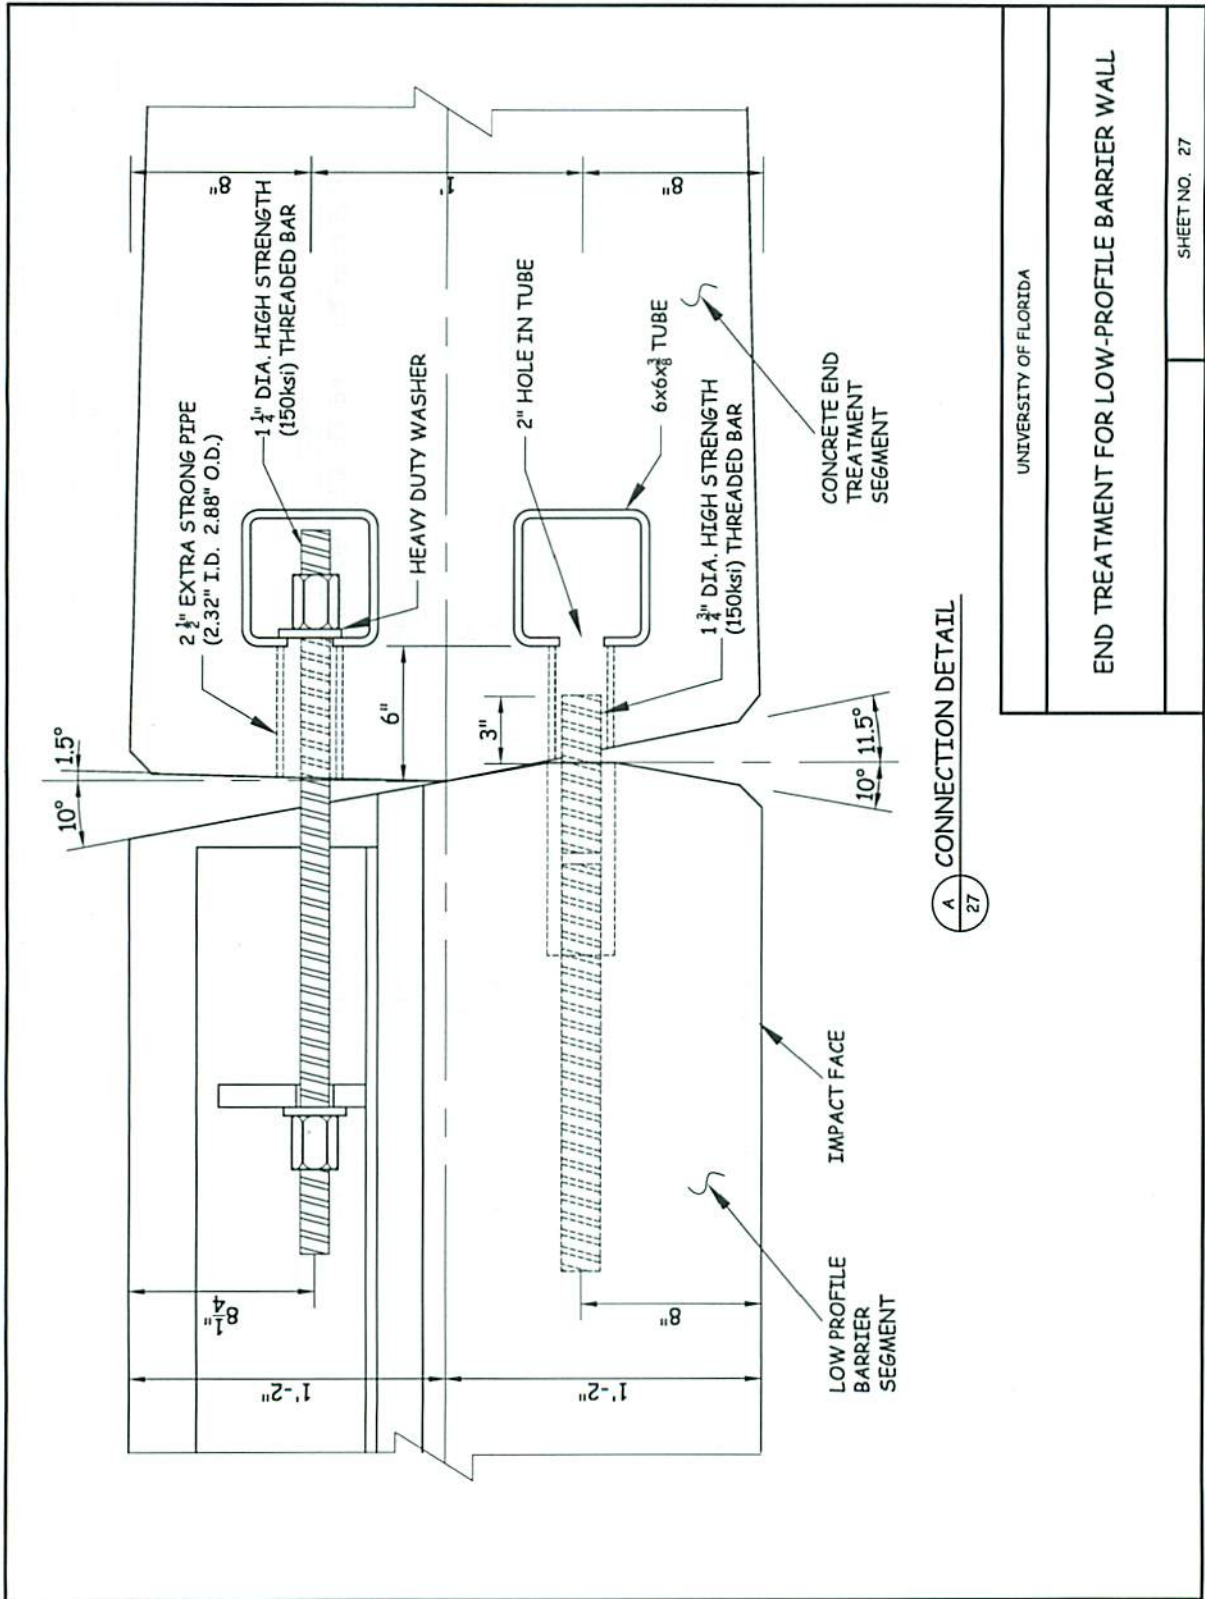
Drawings of Florida Concrete Curb End Treatment (11 of 14)
